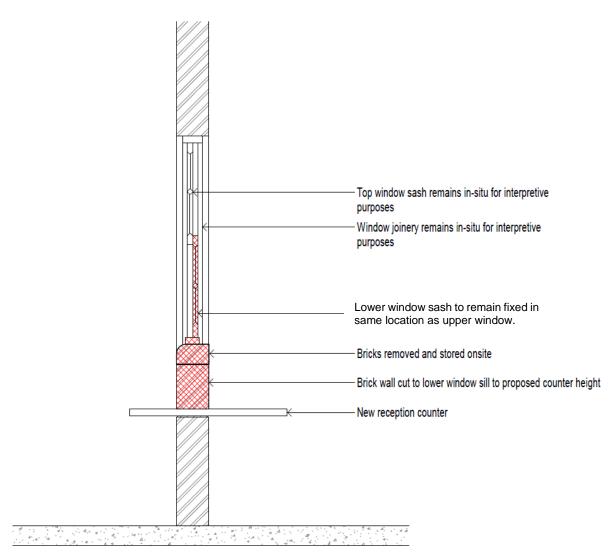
Sash window modification section detail for new reception counter (Williams Architects, 2021).
